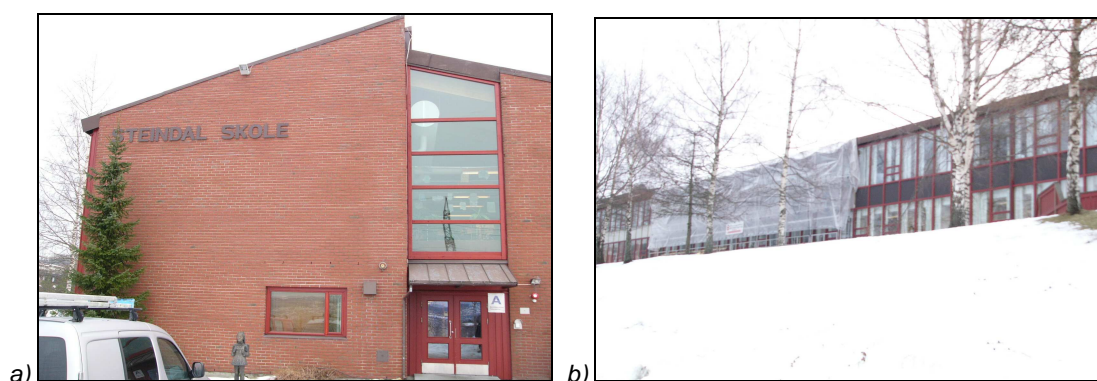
Steindal school a) west façade, and b) north glazed façade.
